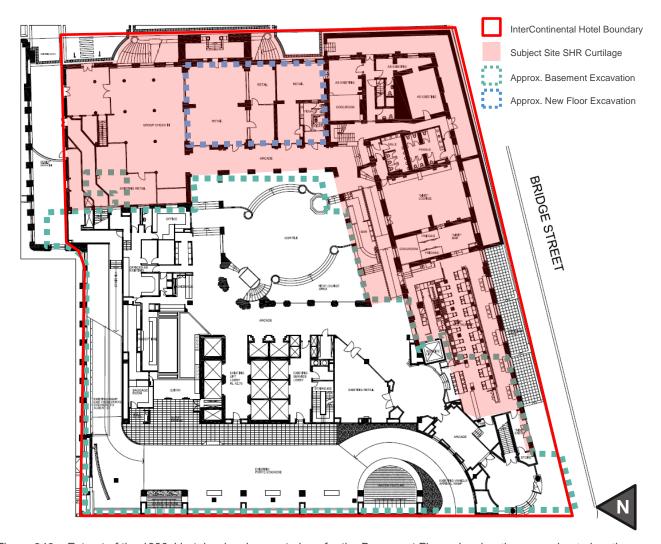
Extract of the 1980s' hotel redevelopment plans for the Basement Floor, showing the approximate location of the largest sub-basement floor (Hotel Basement Level 4) shown in dotted green, as an approximate indication of the extent of excavation undertaken to provide basement space. The approximate area of the Link Building which was excavated and replaced with a new concrete floor is outlined in dotted blue. The broader InterContinental Hotel site boundary is shown in a solid red outline, and the Former Treasury Buildings SHR curtilage (the subject site) is shown shaded red.
